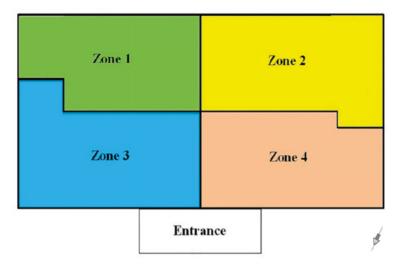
Building plan divided into four zones per floor. The arrow points to the north.
